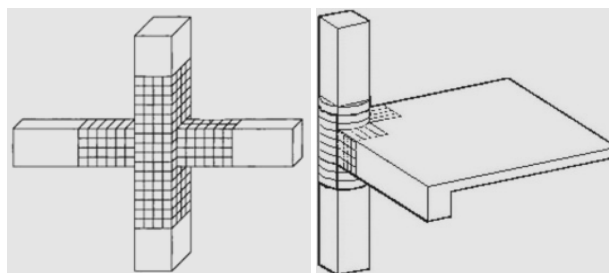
Strengthen the core region of concrete beam-column joints by steel encasement
